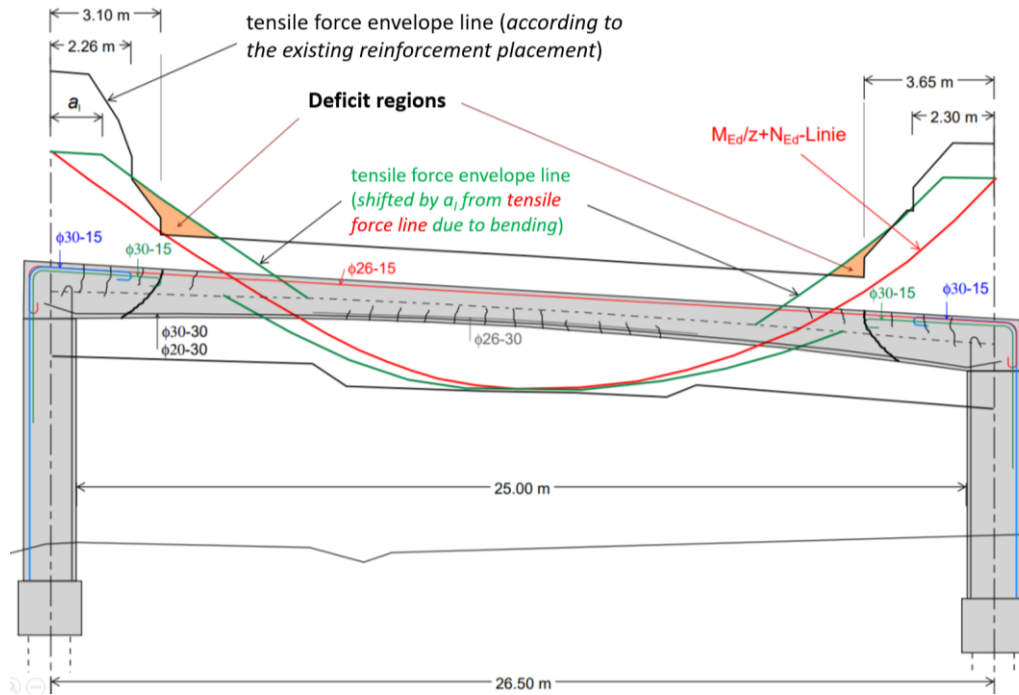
Tensile force in longitudinal reinforcement of Wieselburg bridge
